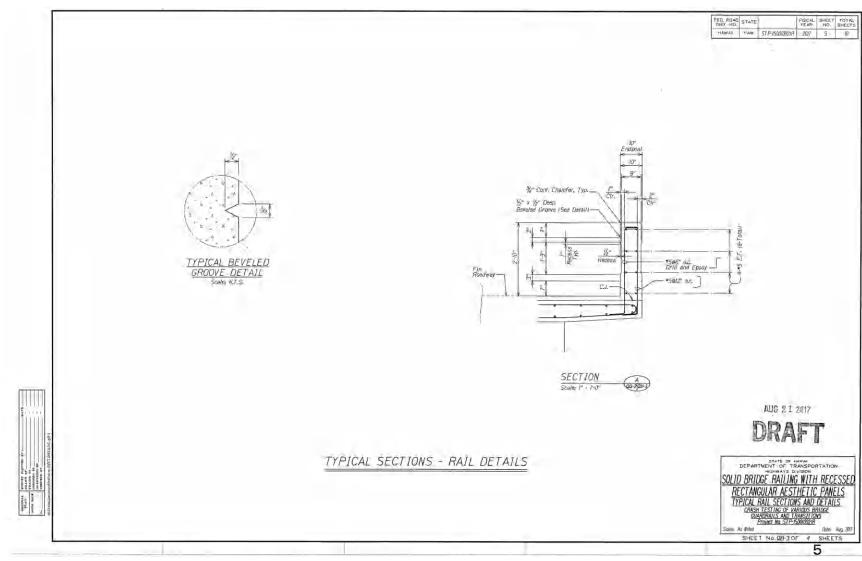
HDOT Standard Detail for the 34-in. Tall, Aesthetic Concrete Bridge Rail
